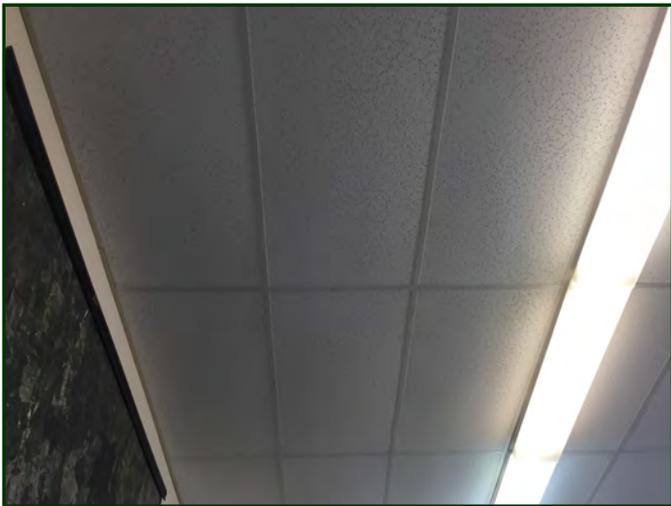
Photograph depicts general view of 2' x 4' Ceiling Tile with Addition Section
